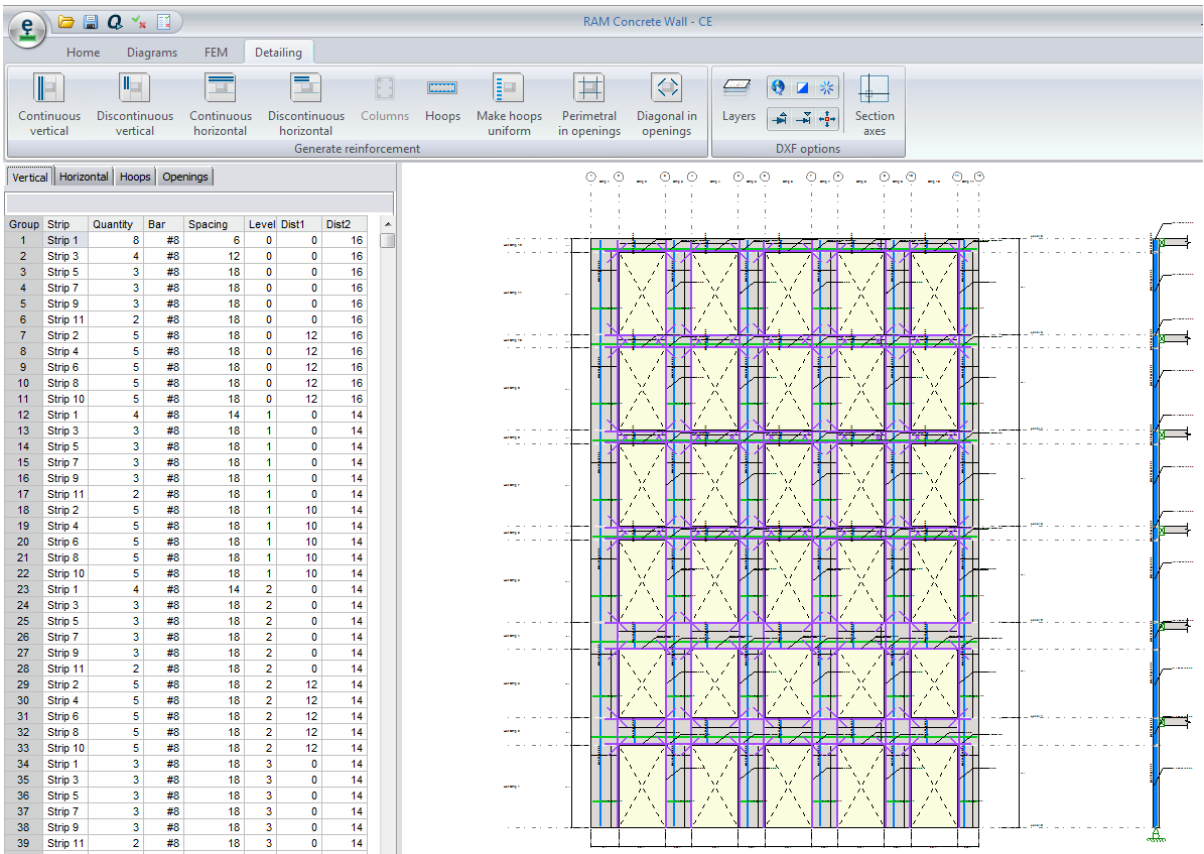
E, Vertical Reinforcement (Part I) Design for CE
